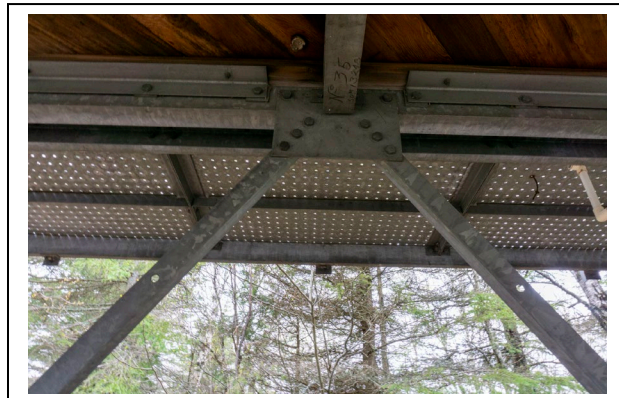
Angle steel and gusset plate construction of Ishpeming Fire Tower, 2019, looking S. Photo by Natalie Young.
